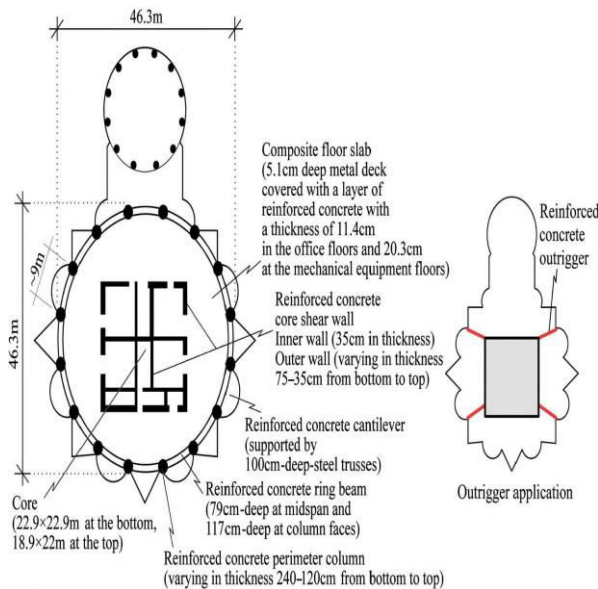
Petronas Twin Towers plan and structural axonometric section
